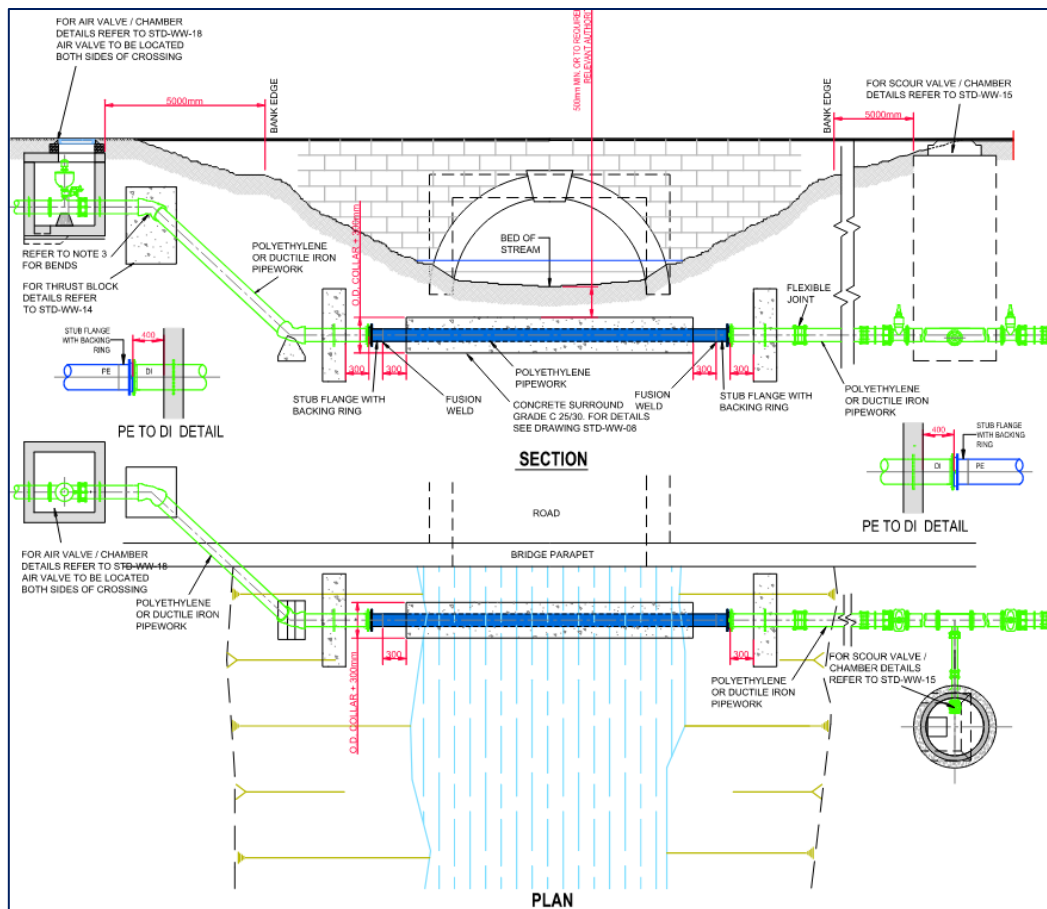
Typical Detail of Rising Main Crossing at Bridge
